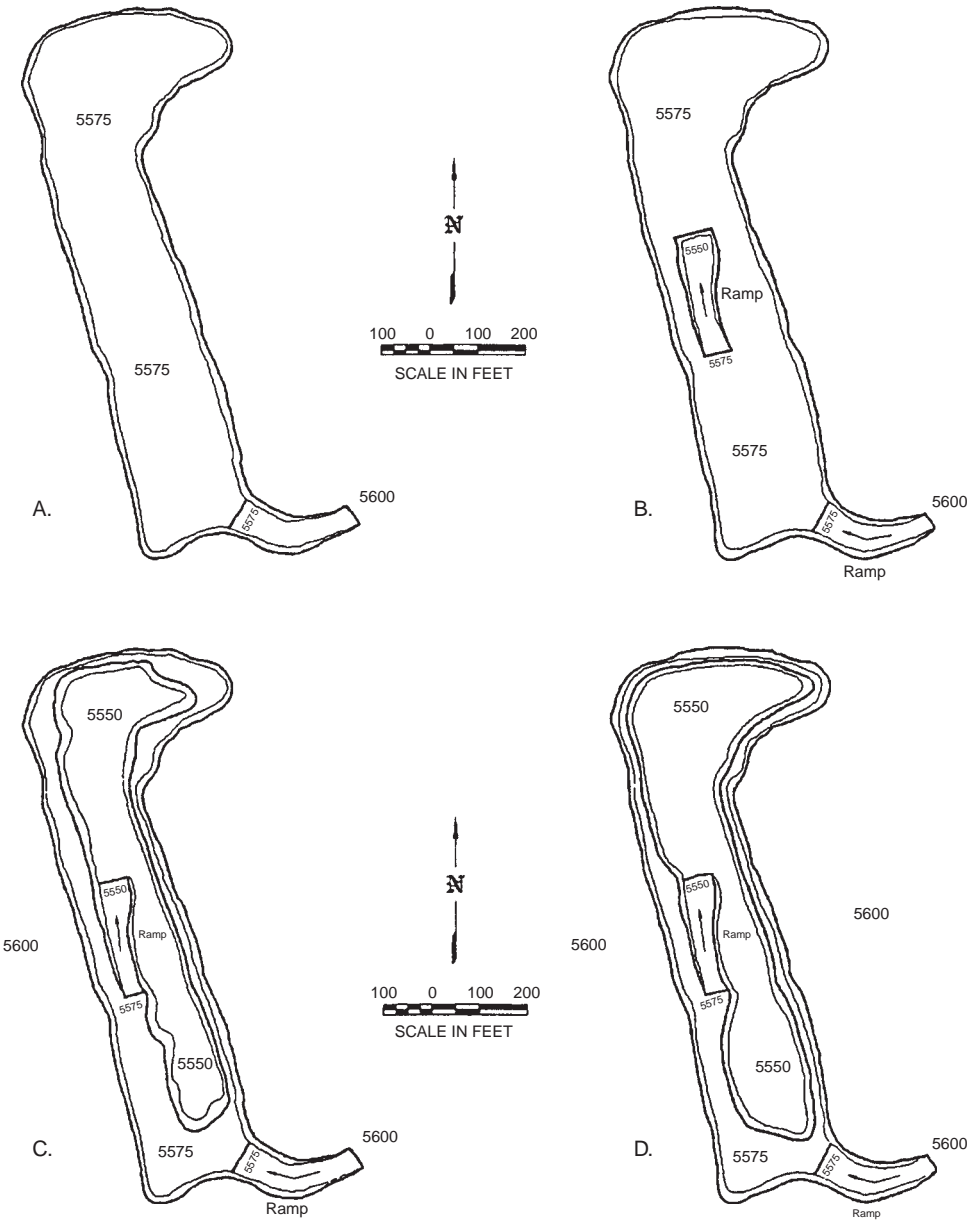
Plan view of an actual pit bottom showing drop cut and mining expansion (McWilliams, 1959).
